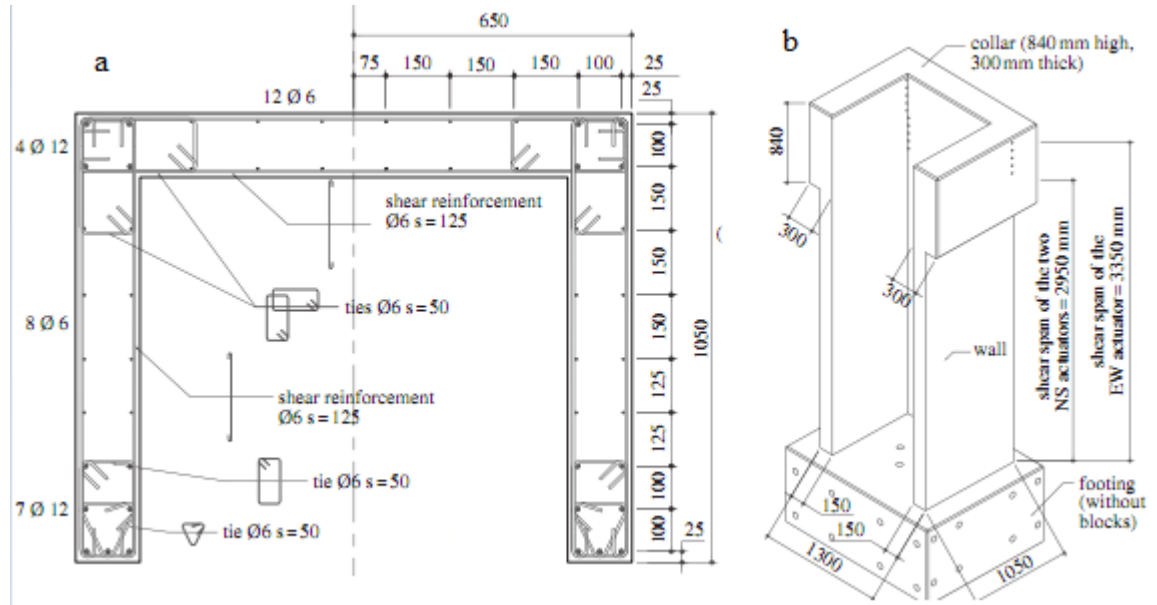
(a) Wall cross section (b) elevation (*K.Beyer & R.Constantin, 2012*)
